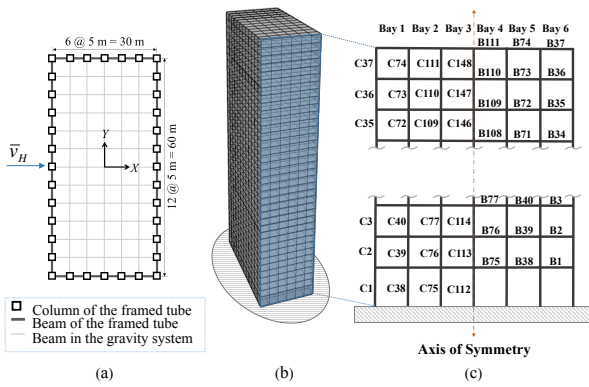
(a) 37-story building plan; (b) Isometric view; (c) Frame layout showing beam and column assignments.
